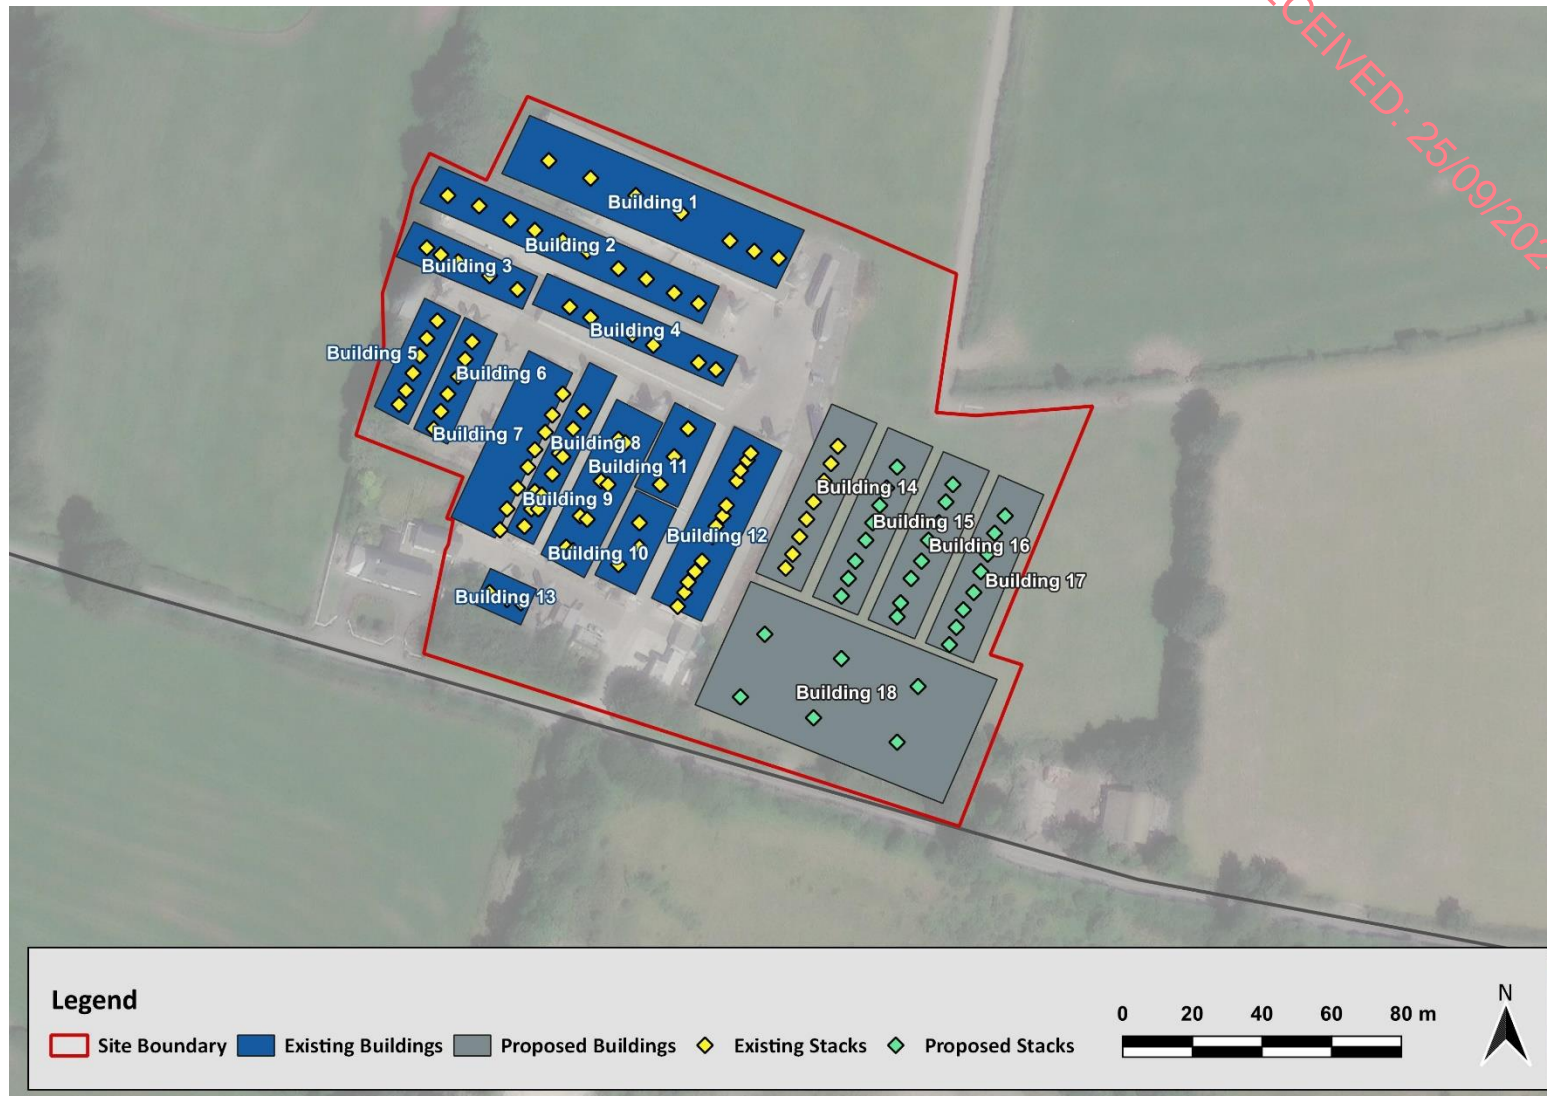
Moate Pig Farm Site plan – existing and proposed housing units and existing and proposed chimney stacks
